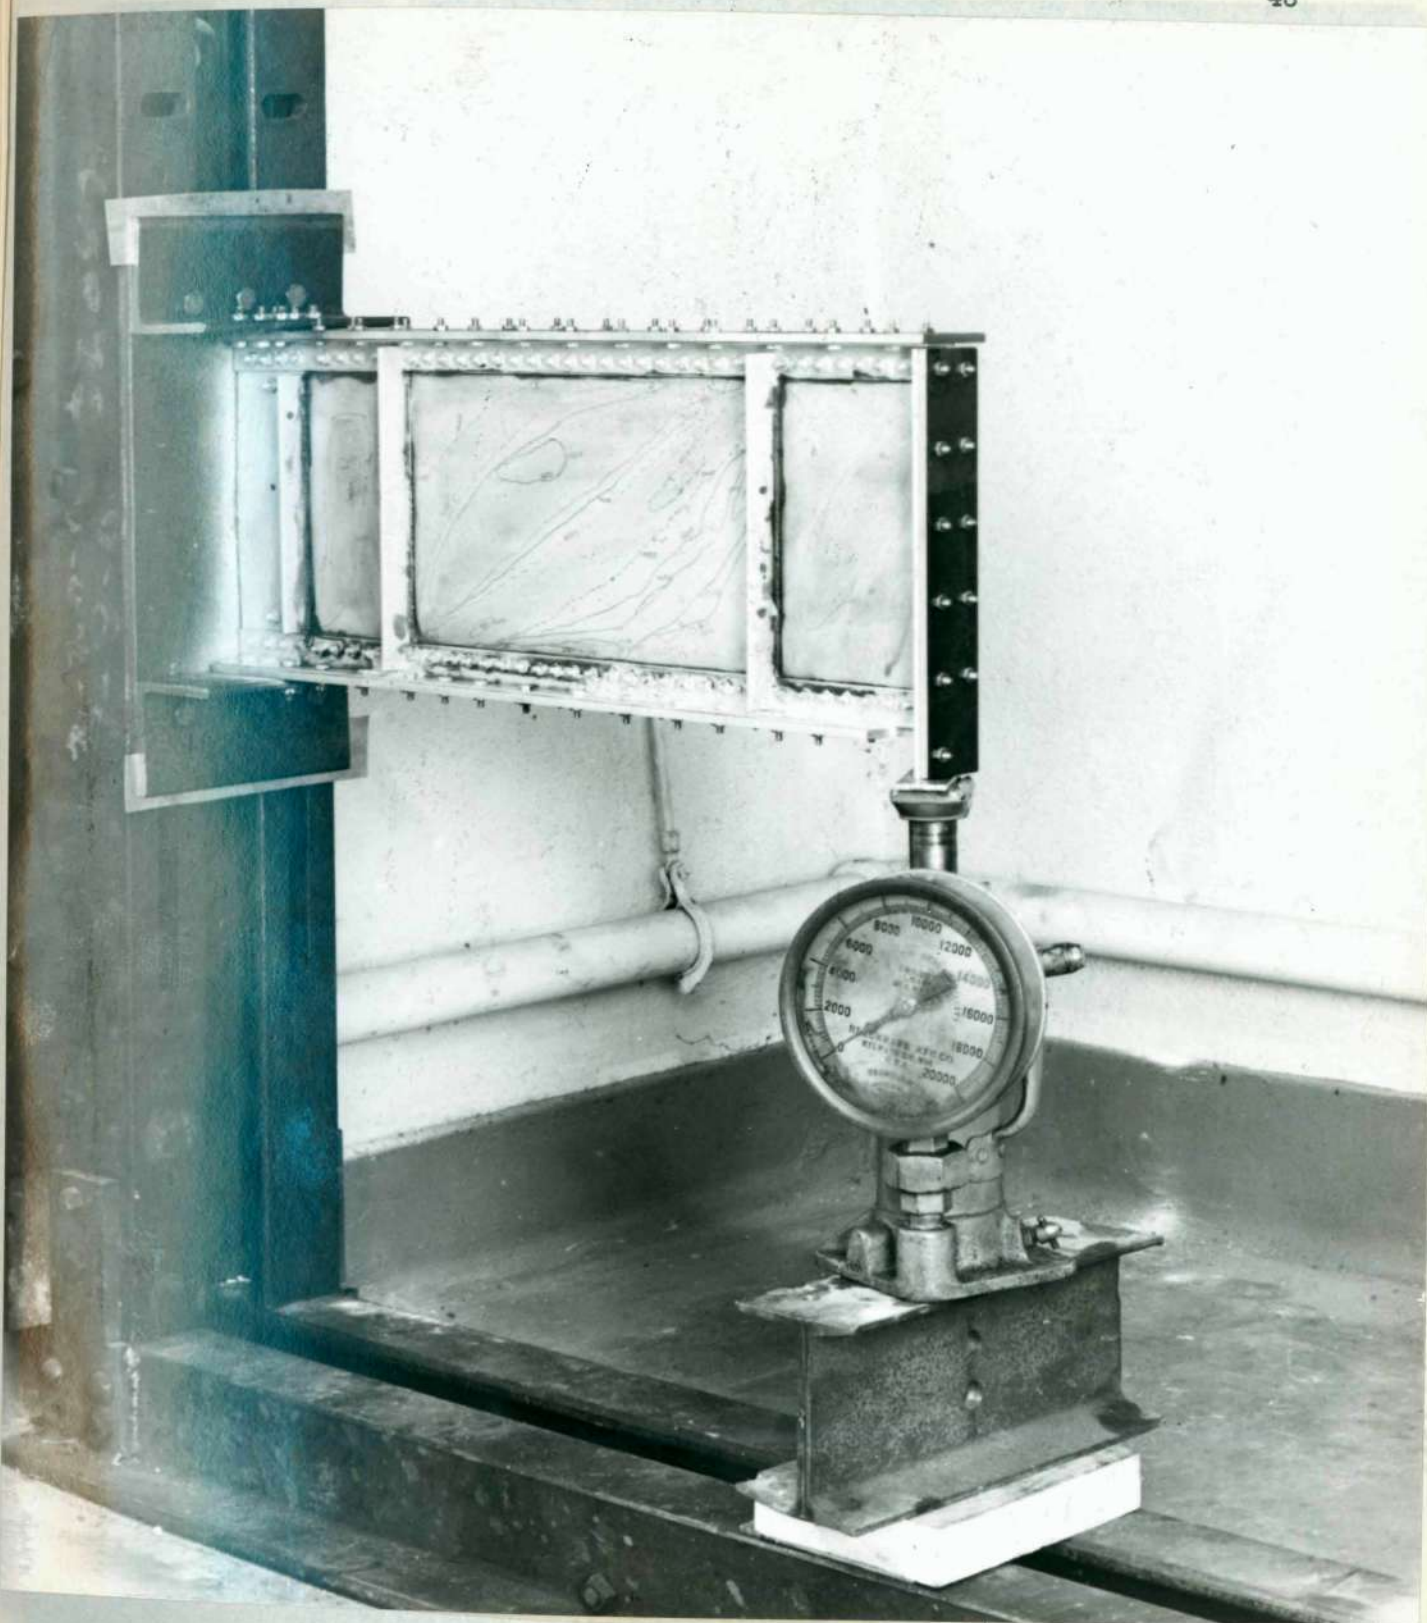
View showing test set-up employed in tests one through four, with beam of tests one, two, and three mounted in jig.
